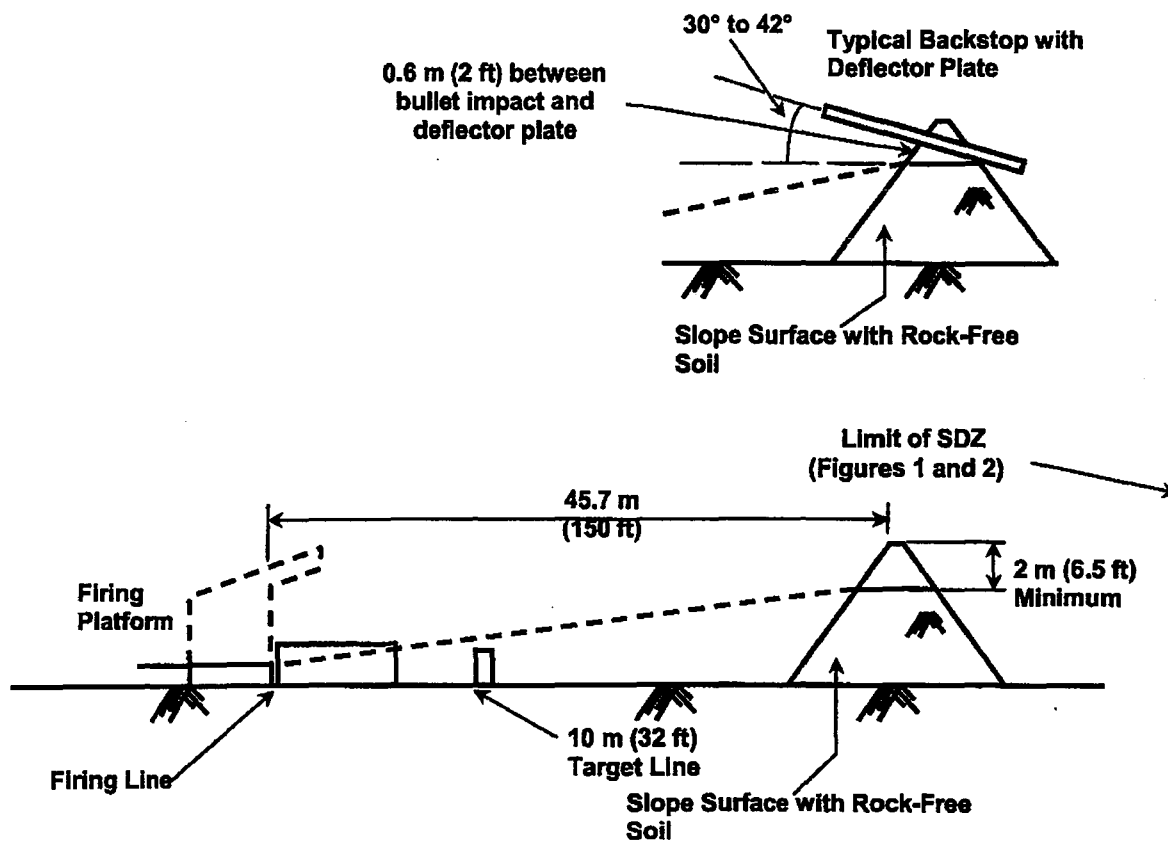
Machine Gun, 10-Meter Tube Range Typical Cross-Section
